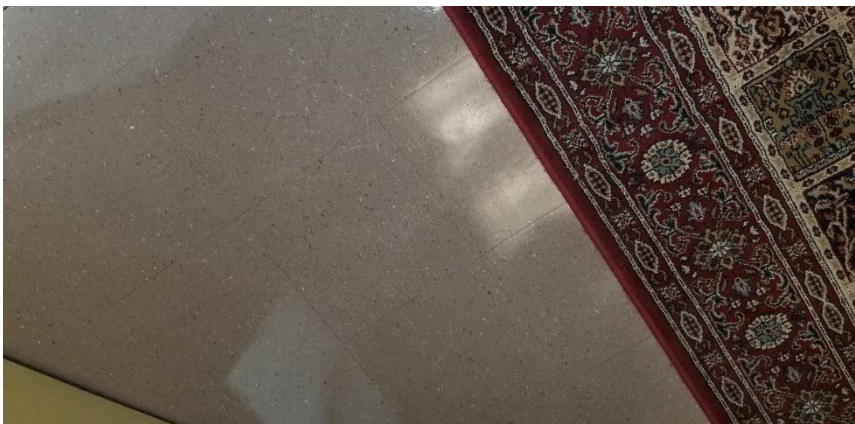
View of non-asbestos containing vinyl floor tiles (12"x12"-Purple) observed in Room 324.
